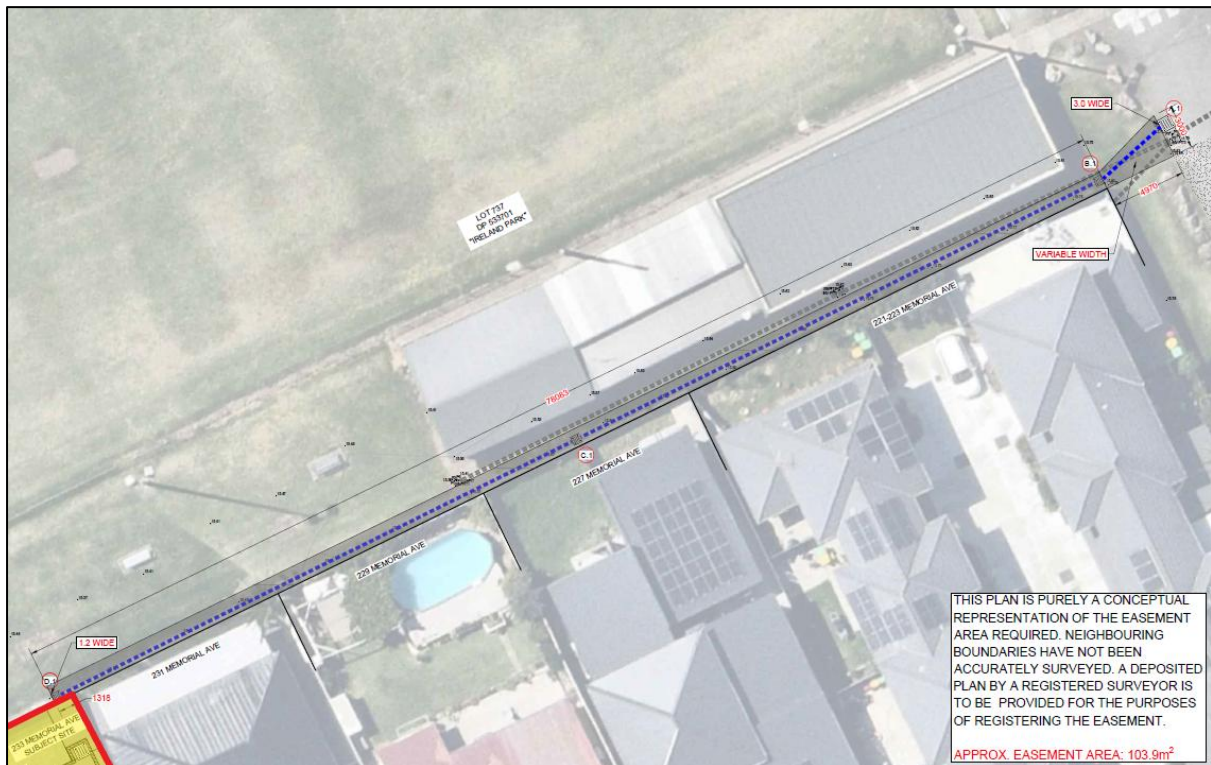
Proposed easement and stormwater infrastructure within Ireland Park.
